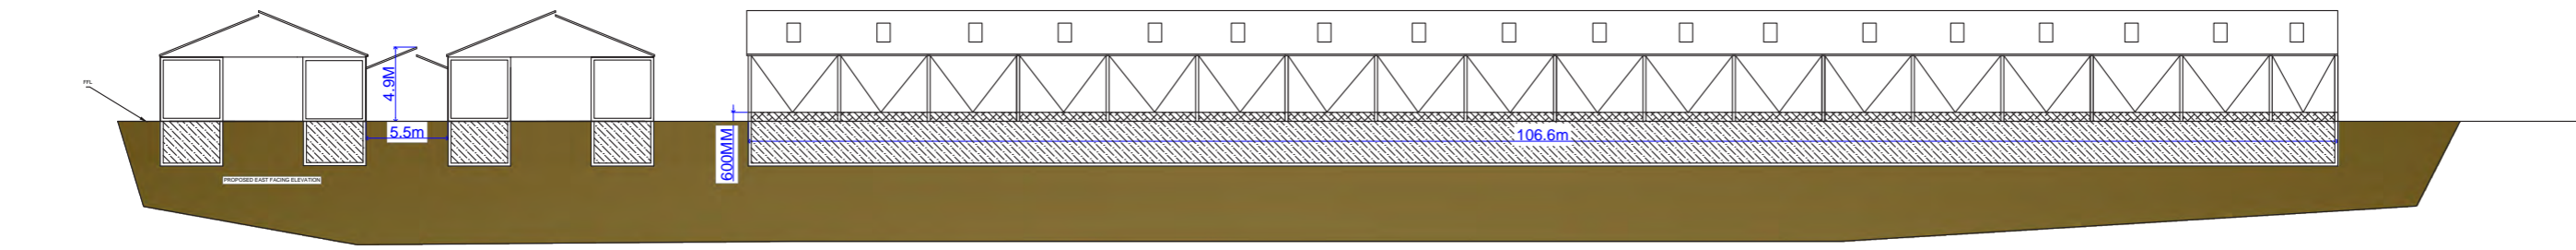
Proposed Site Plan and Elevations for Agricultural Livestock Building
